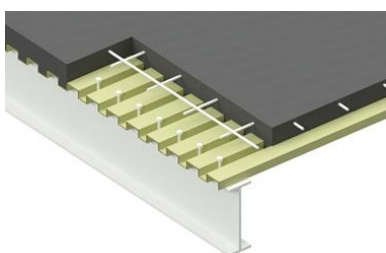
Typical arrangement of a composite structure employing shear connectors
